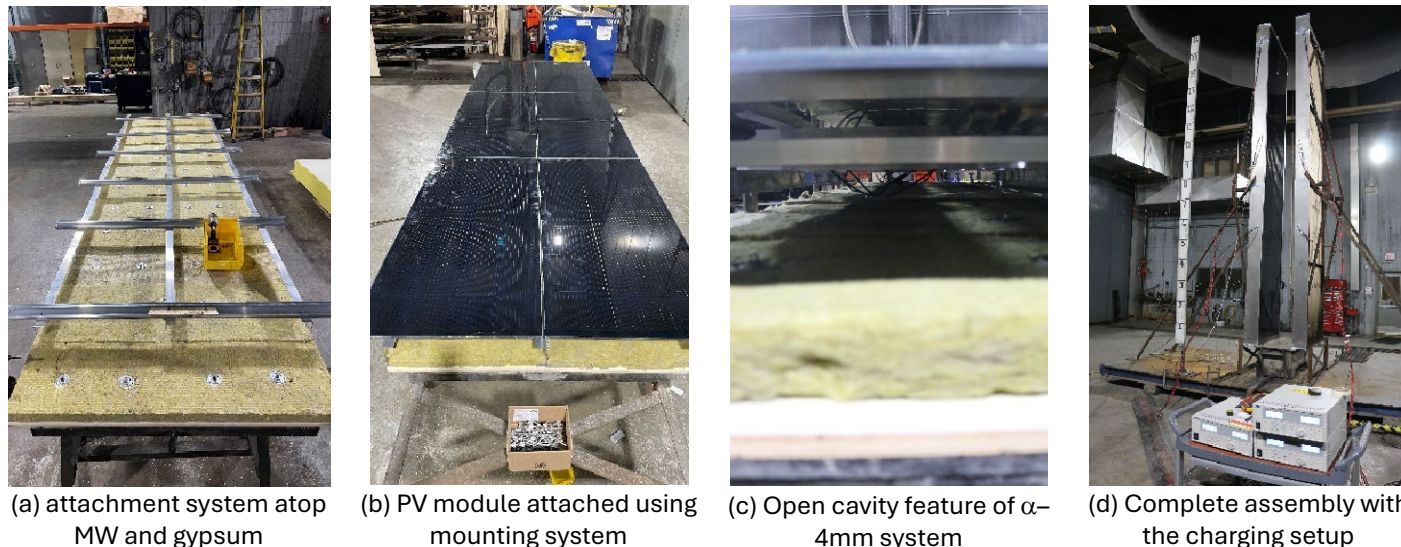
16-ft PPT setup preparation for α -4mm cavity-wall façade setup.
